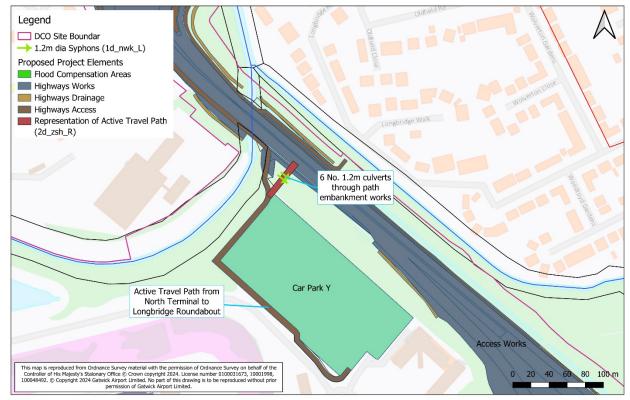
Active Travel Path route from North Terminal to Longbridge Roundabout.
